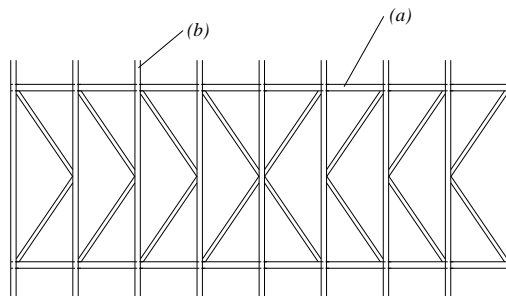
K-truss. (a) Braced beam, (b) purlin. (STEP 1995 Article D9)
